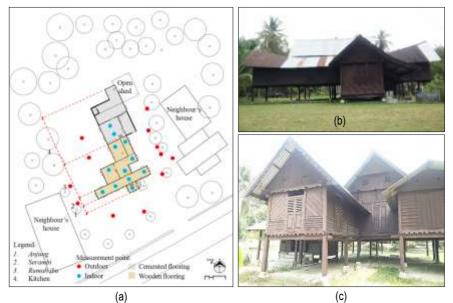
Site plan: The house's spatial division and measurement points inside the house and outdoor area (a), the long roof house form and zinc as a roofing material (b) and full-height timber panel windows and gable end.
